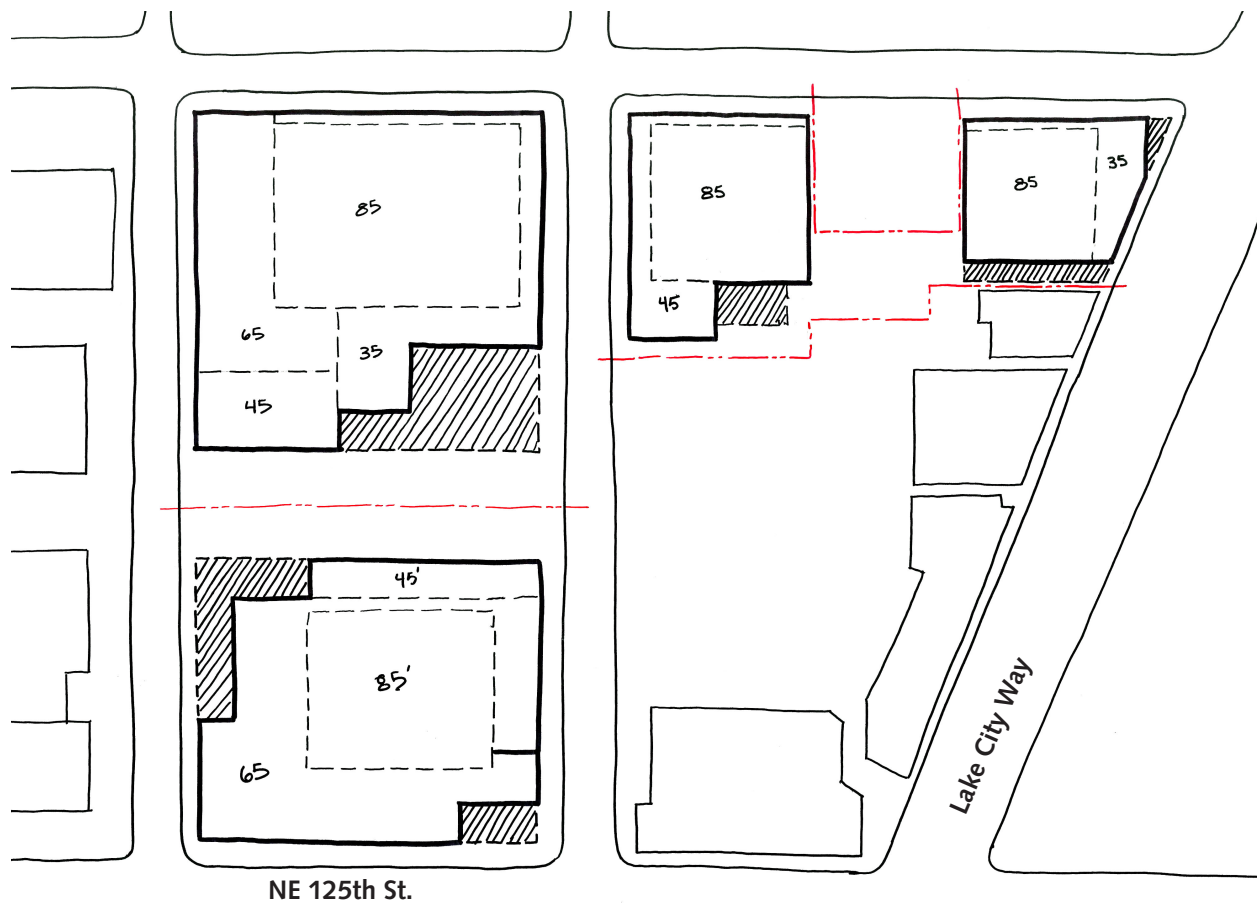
Plan view building envelope. Designated height limits respond to layout of social infrastructure. Social infrastructure that may be integrated indoors or outdoors is hatched; areas for outdoor pathways or nodes are excluded from the building envelopes. Building envelopes are designed to respond to social spaces, and provide transitions in height as well as visual interest.
